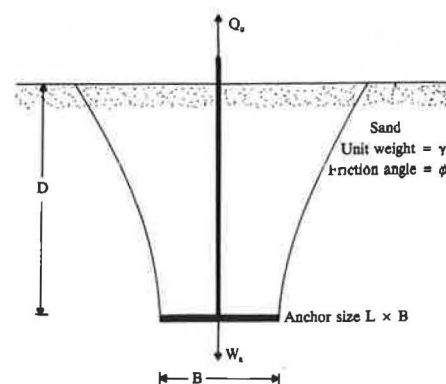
Geometrical parameters of shallow horizontal anchor.
